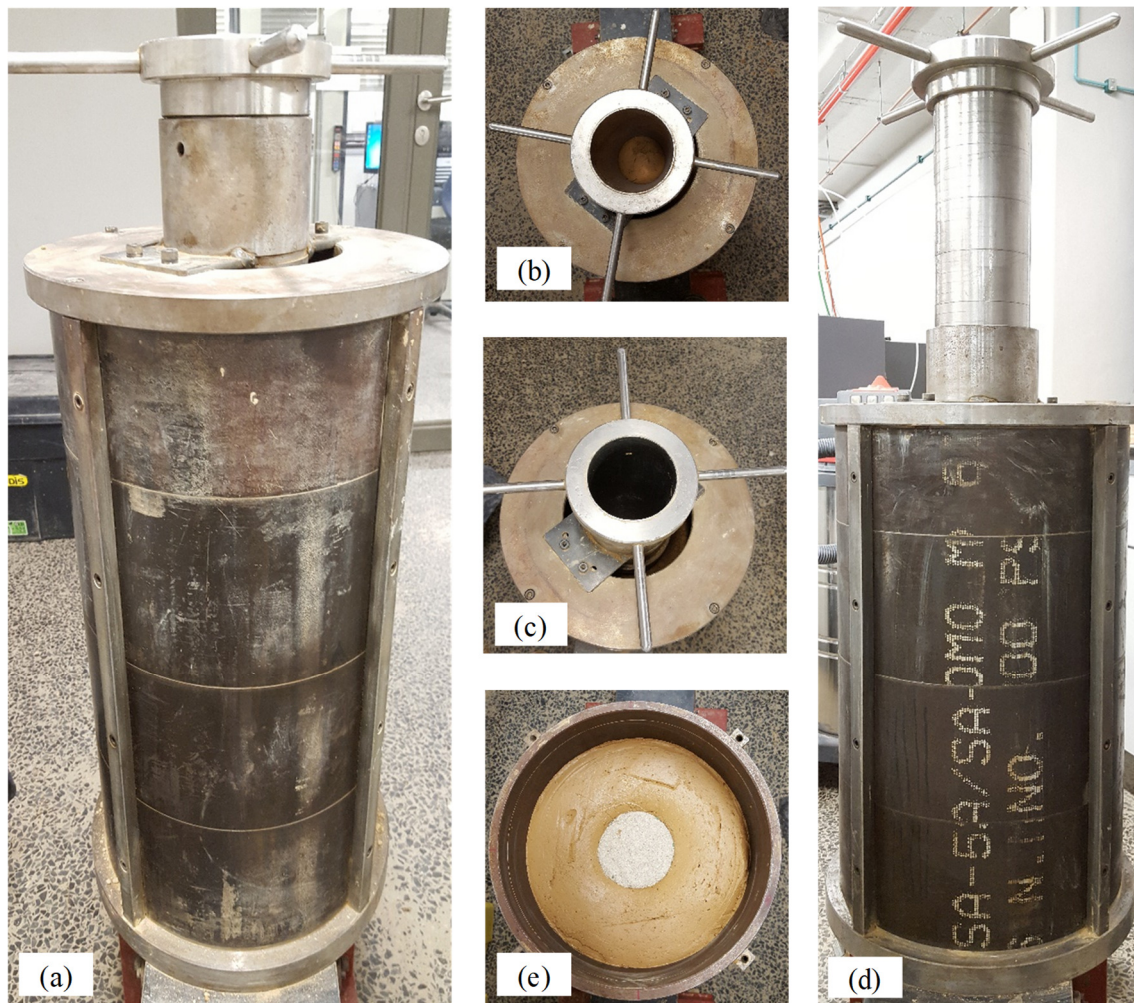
Stages in column installation within the base soil (a) hollow steel pipe pushed through the collar, (b) silt inside pipe to be removed using the auger, (c) inner surface of pipe cleaned by means of a nylon brush, (d) retraction of the pipe after a layer of sand has been poured, (e) column of length 400 mm formed
